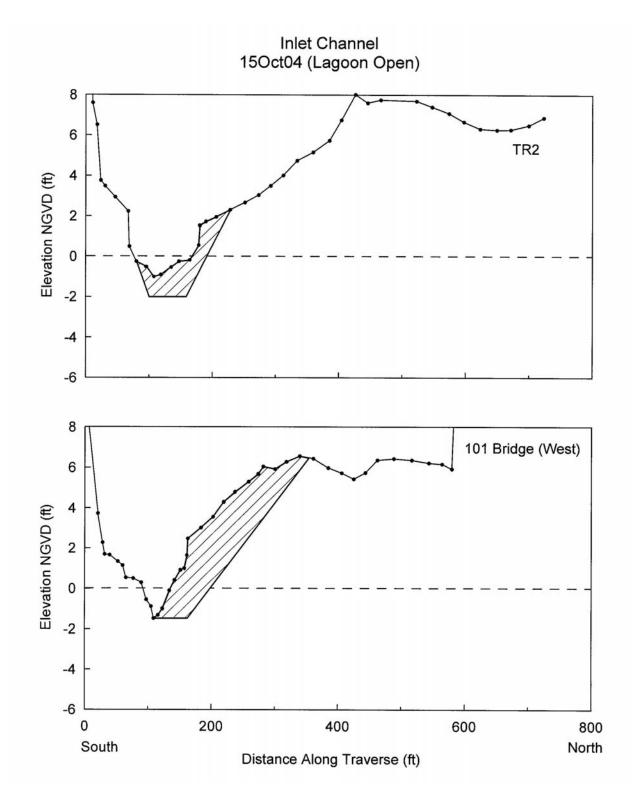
Proposed excavation of the inlet channel west of Highway 101 Bridge.
